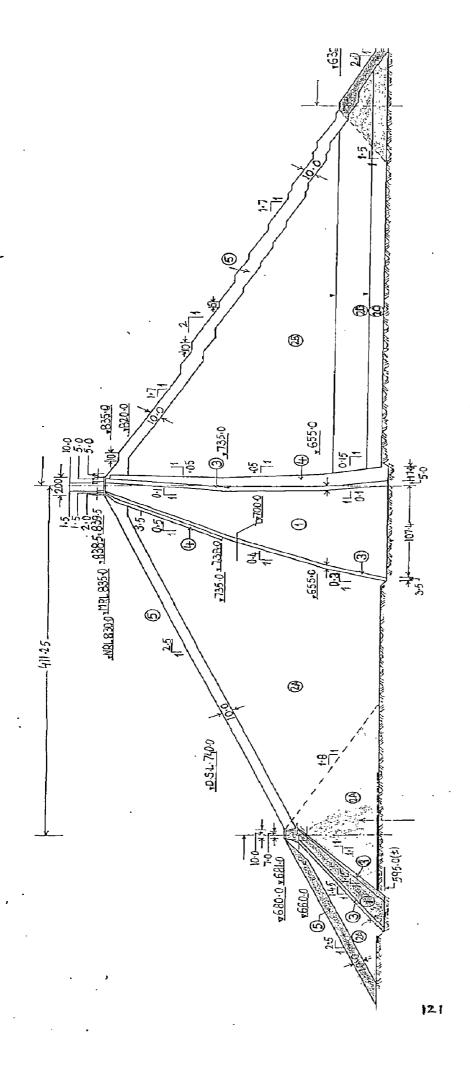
Main dam section - Cofferdams built as part of Main dam
